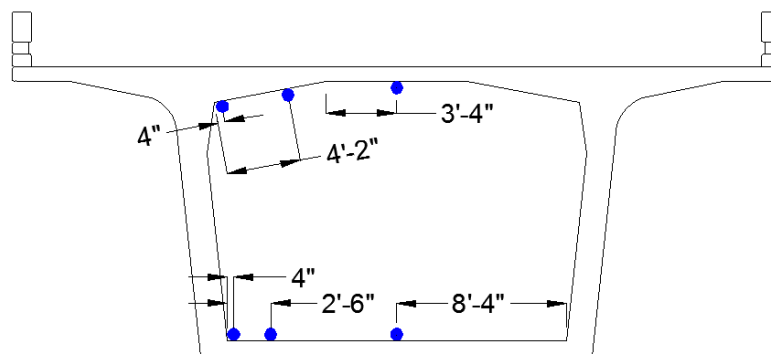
Smart Road Bridge Section B Longitudinal Strain Instrumentation – Looking in the Direction of Southbound Traffic
